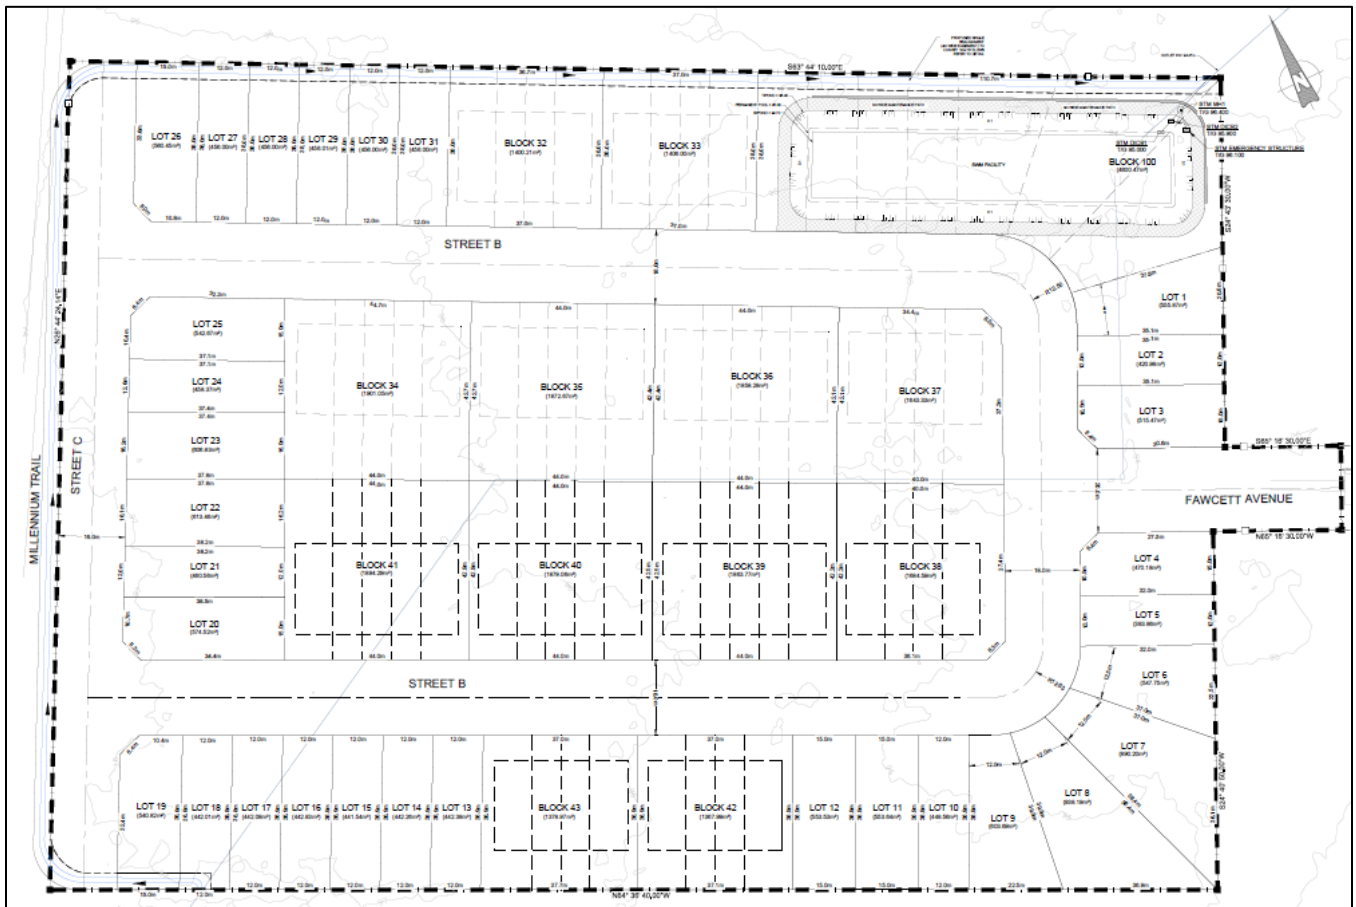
Draft Plan of Subdivision (Source: Ainley Group)
